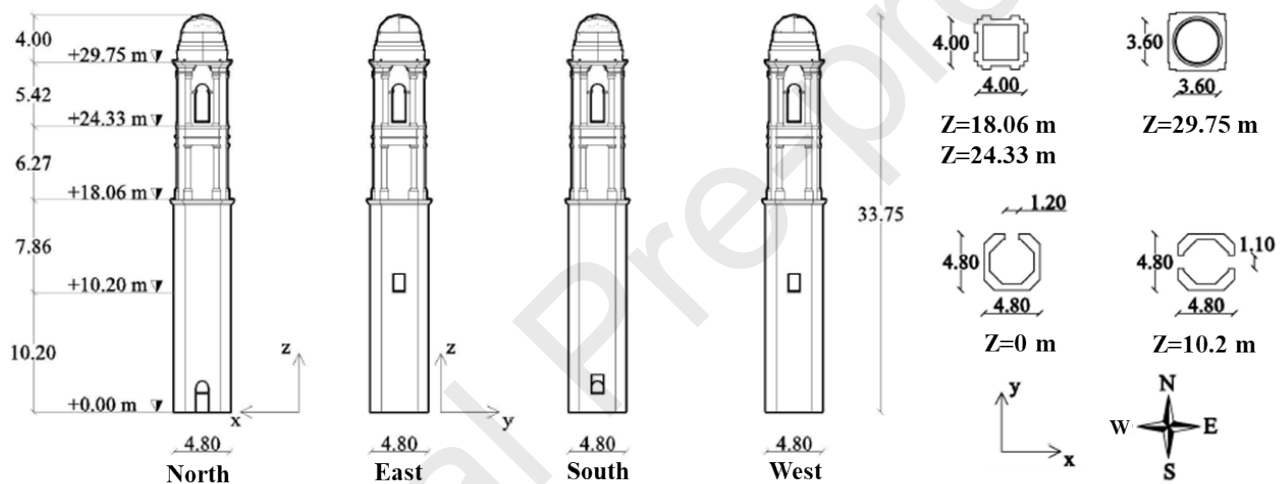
Tower 2. Elevation views, plan and relevant sections of the bell tower with indication of the main geometrical dimensions.
